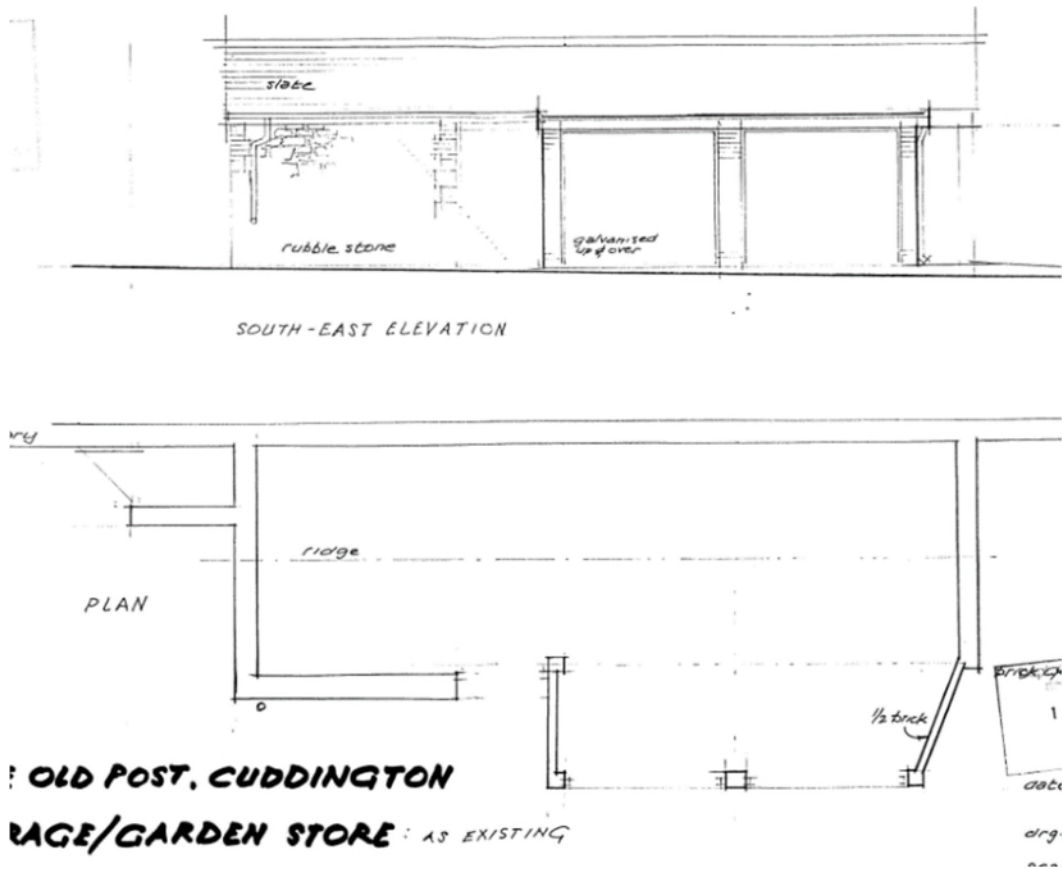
As existing plans submitted as part of the application for the garage (05/02086/ALB)
